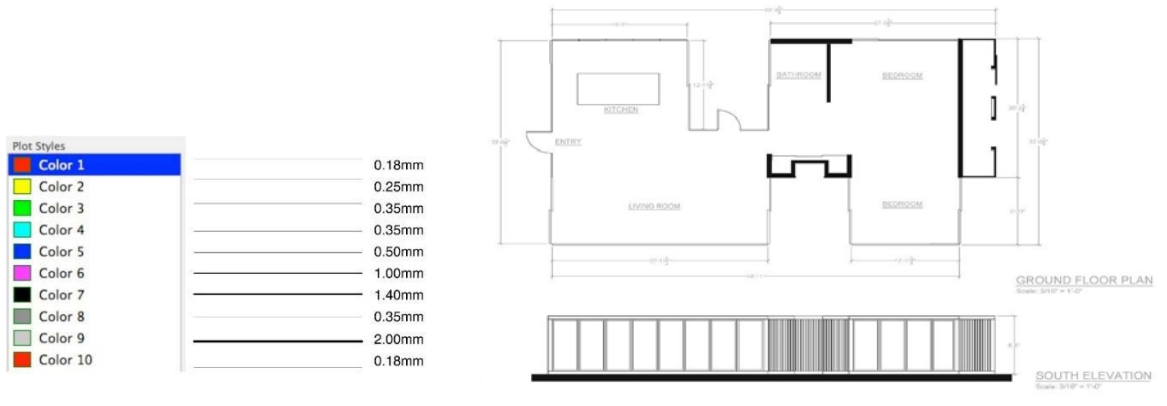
Screen capture of AutoCAD Pen Styles window (left); 3b: 2D AutoCAD plan and elevation drawing (courtesy of Erin Toy, Syracuse University).
